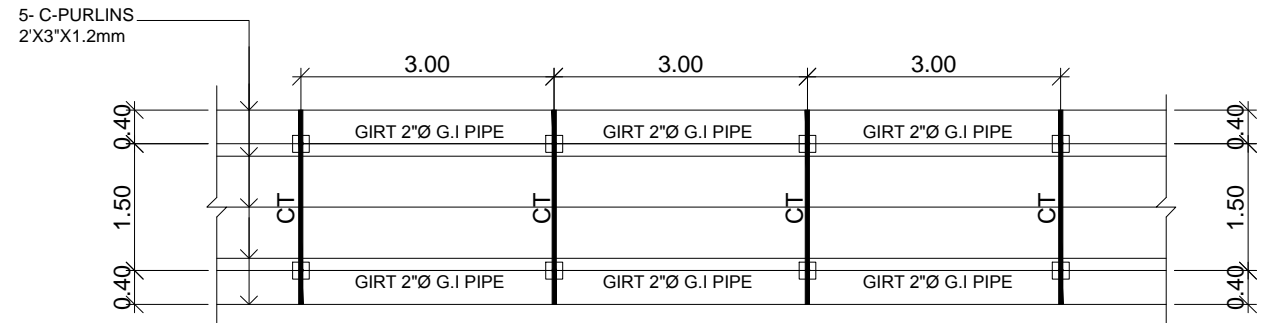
DETAIL "A" TYPICAL CURVE TRUSS (CT) DETAILS
